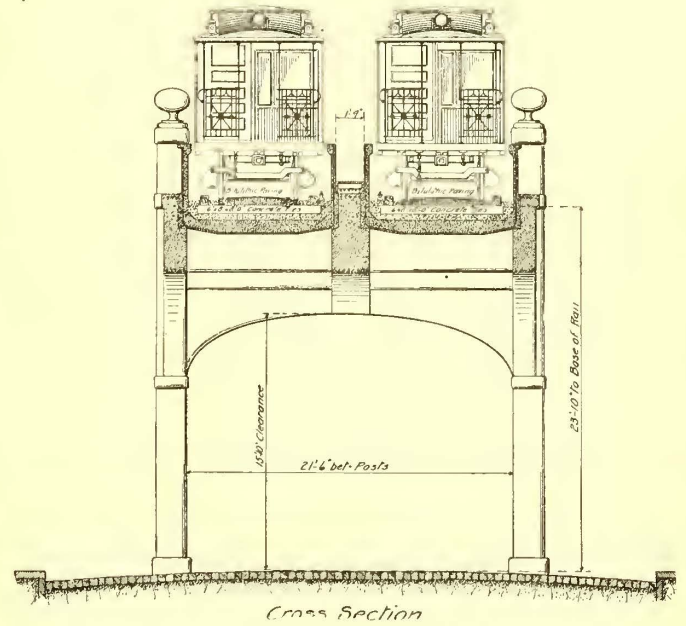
TRANSVERSE SECTION OF SUGGESTED CONCRETE STRUCTURE
